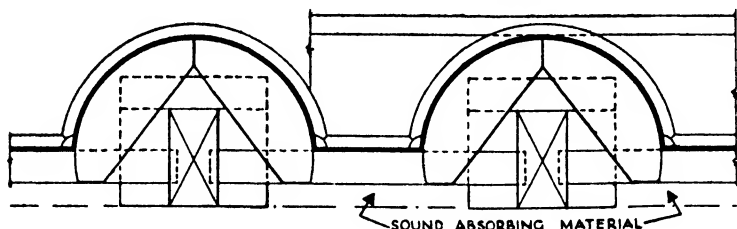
PLAN OF TYPICAL CONSTRUCTION OF DIFFUSING PANEL
